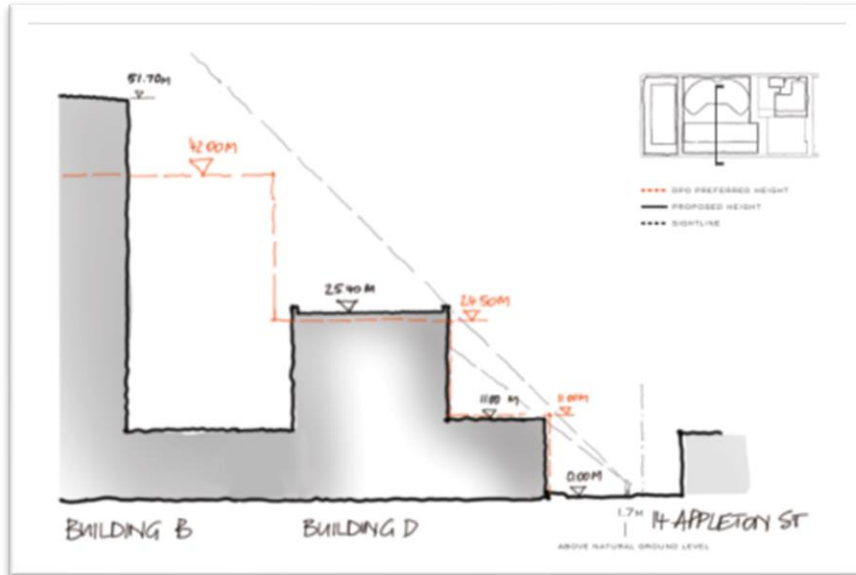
Sightline diagram from Appleton Street to Building B. Source: Development Plan (Gurner 2023)
